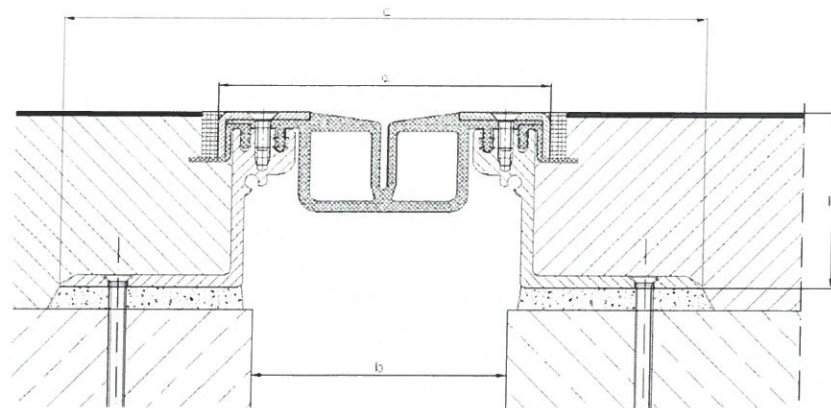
CONECTO PARK GA 63.30.90& S waterproof expansion joint profile
